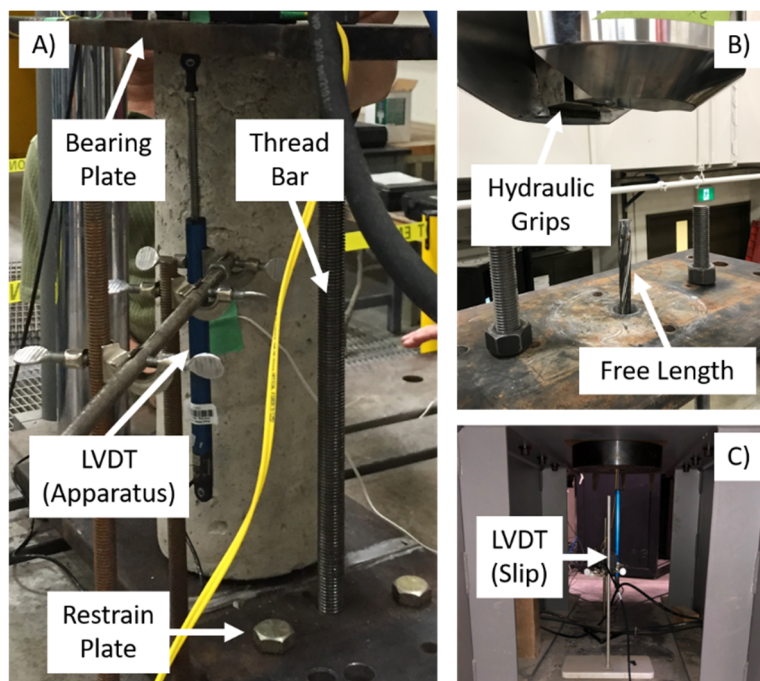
Detail view of the coaxial testing apparatus. (a) Example constrained concrete specimen and the linear variable differential transformers (LVDT) arrangement used to measure specimen displacement; (b) Top view of the bearing plate. A 25.4 mm hole was drilled through the plate for the reinforcement element to extend through to the hydraulic grips; (c) View of the LVDT arrangement underneath the MTS workbench that was used to measure slip of the reinforcement element. Penny and Giles SLS190 LVDTs were used in this study (200 mm capacity, repeatability of at least 0.01 mm)
